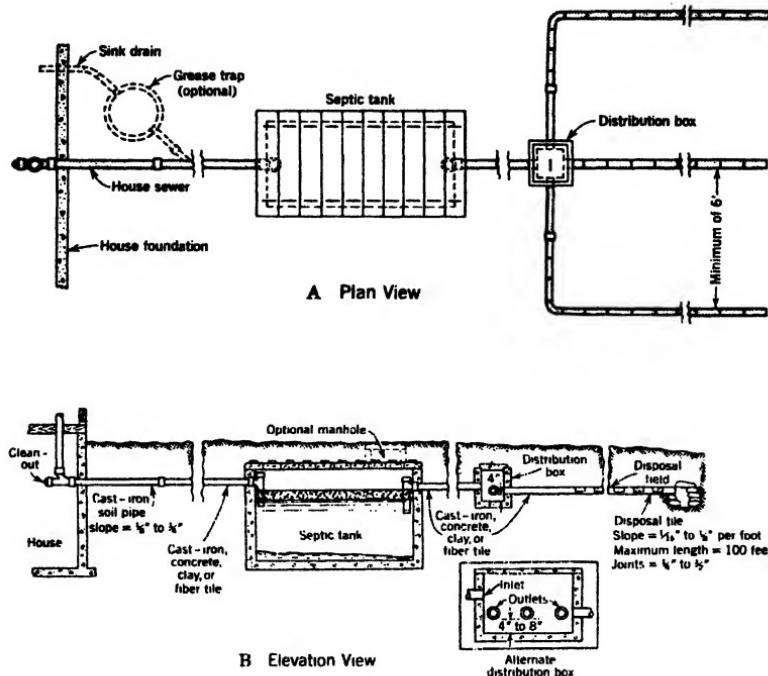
Plan for domestic sewage disposal system where the ground is fairly level. Figures 11-9 through 11-12 illustrate alternate systems for uneven ground. Cast-iron soil pipe should be used at least to a point 4 or 5 feet beyond the house foundation, preferably all the way to the septic tank. From the septic tank to the distribution box and a few feet beyond, cast-iron, concrete, vitrified clay, or bituminized fiber tile, with tight joints can be used. There should be at least two lines of disposal tile of equal length out of the distribution box.
